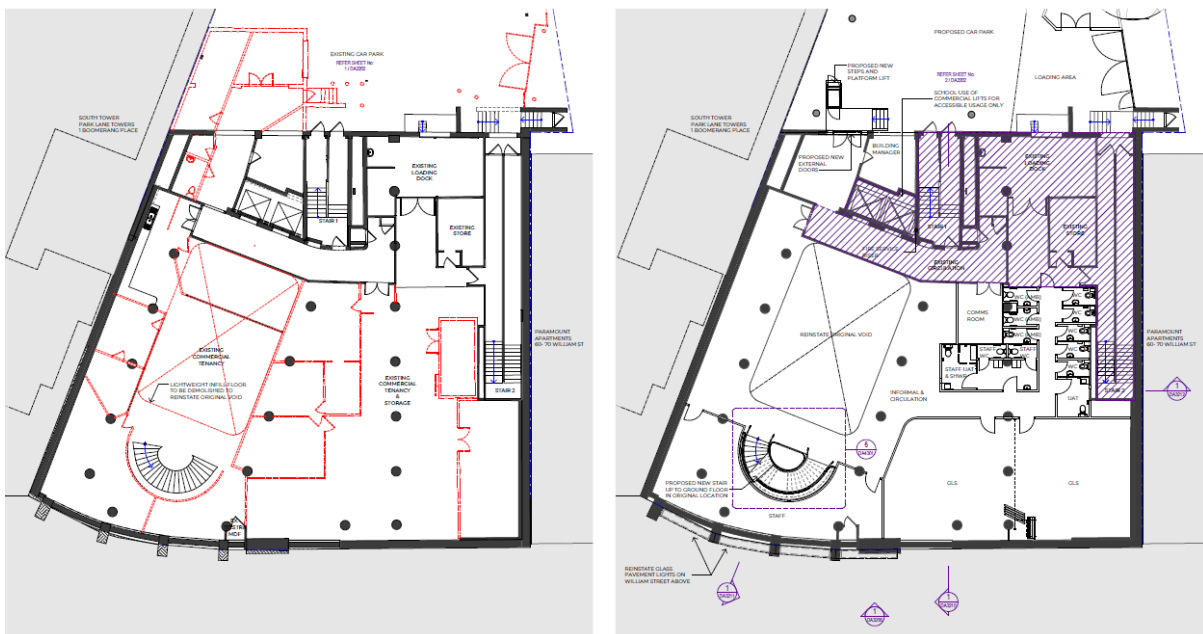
Proposed internal lower ground demolition (left) and proposed lower ground floorplan (right)
